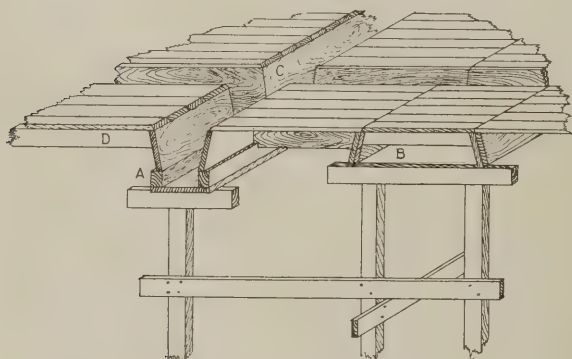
Construction of the "Unit" System of Forms for Concrete Floors.
